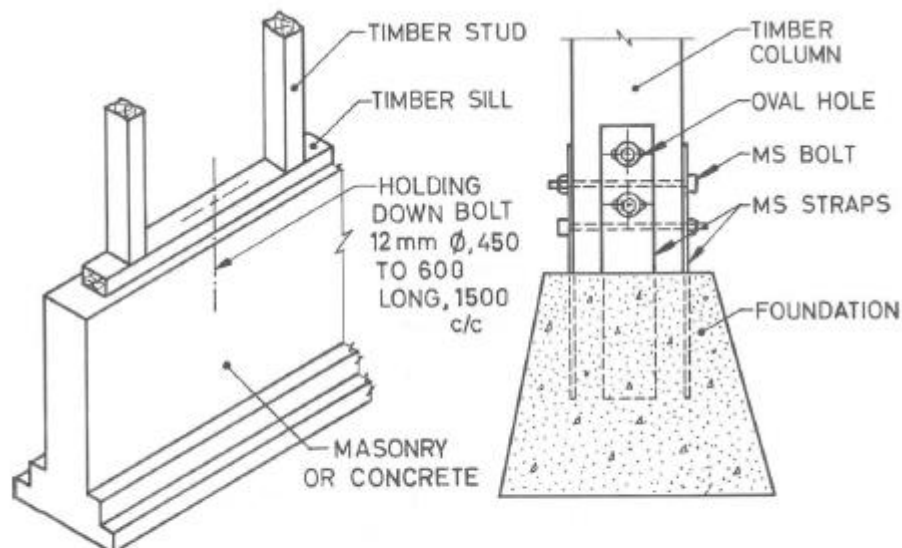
DETAILS OF CONNECTION OF COLUMN WITH FOUNDATION
